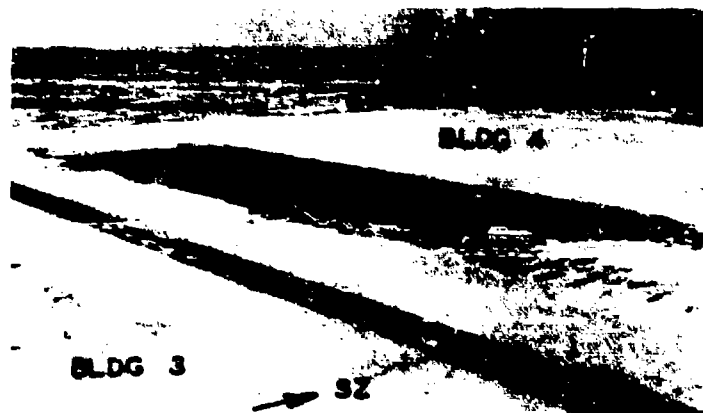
Post-Elder, (Item 26) Station 3.1.1, outside view of punched-in roof section at north end of Building 4. Pressure level: Elder, 20 psi.
